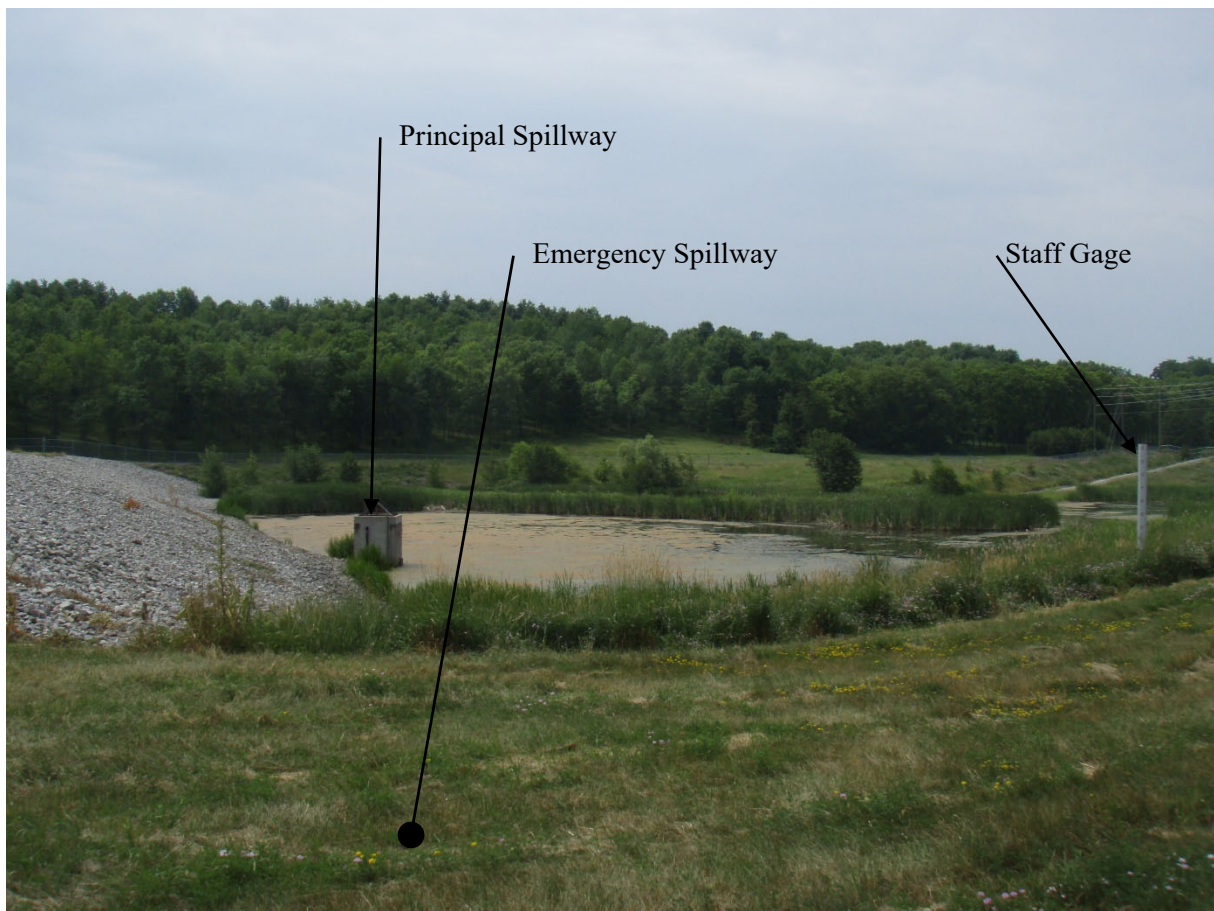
Photograph Showing Staff Gage, Emergency Spillway, and Principal Spillway from North Access Road
